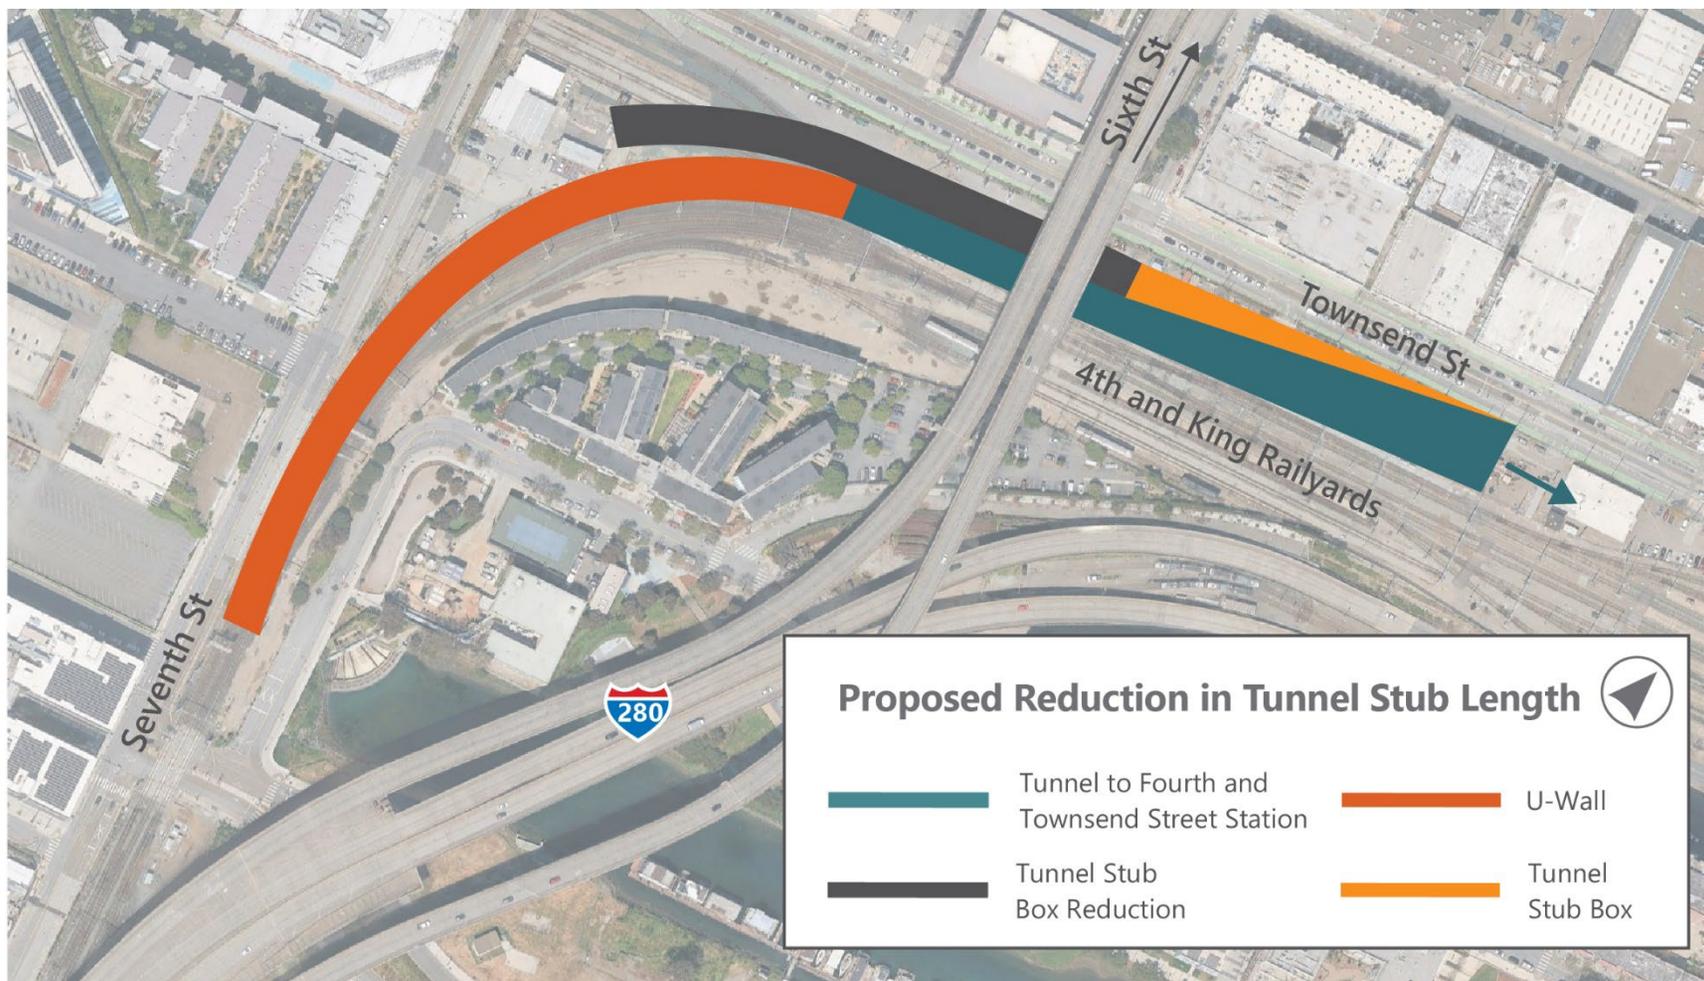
Proposed Reduction in Tunnel Stub Box Length
